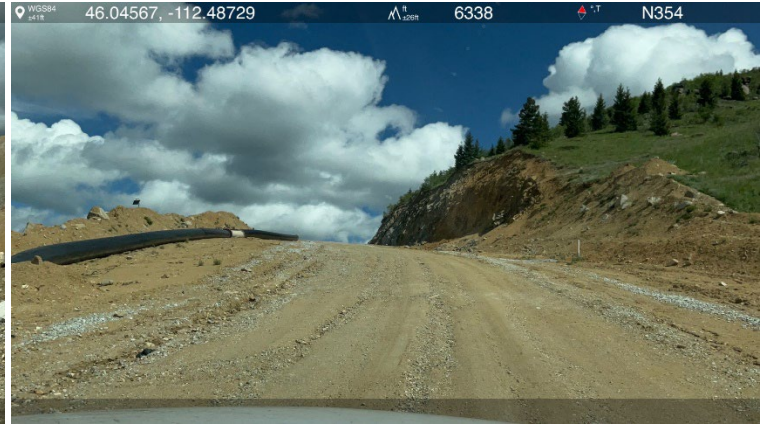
The primary haul route now follows along the ramp constructed on the N-S Embankment. Photo 6- The return water lines are functioning along the new barge access road (east side of YDTI), the former road will be decommissioned as the tailings and pond elevations rise.
